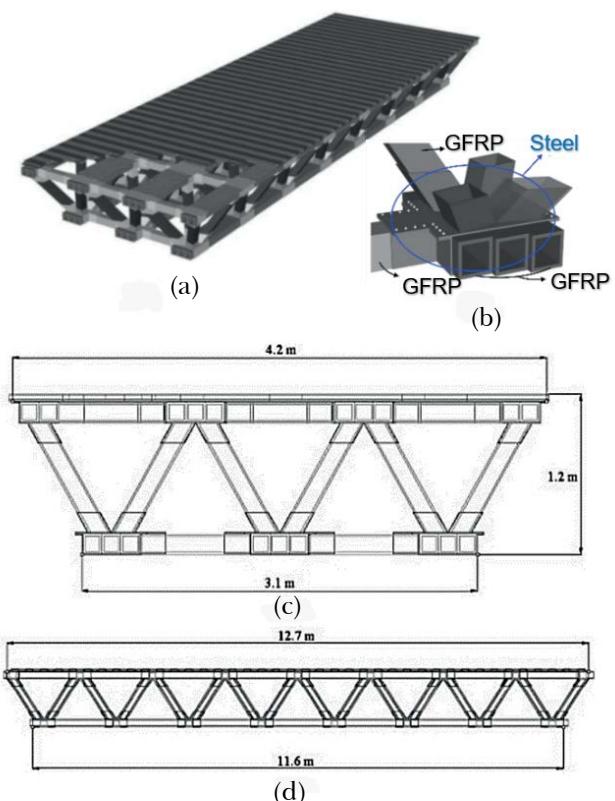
GFRP vehicular bridge: (a) general view, (b) detail of the steel nodes, (c) cross-section, and (d) longitudinal view. Source: [9].
